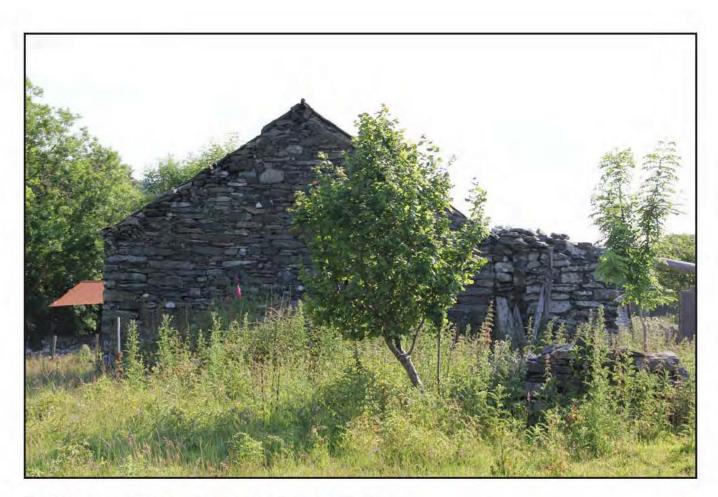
Southwest facing external elevation, from the southwest. Scale 1.0m.
